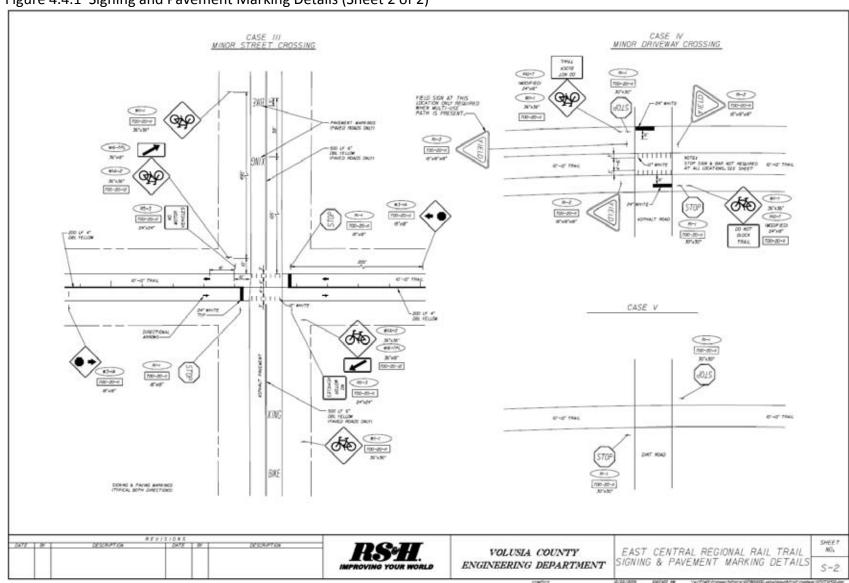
Signing and Pavement Marking Details (Sheet 2 of 2)
